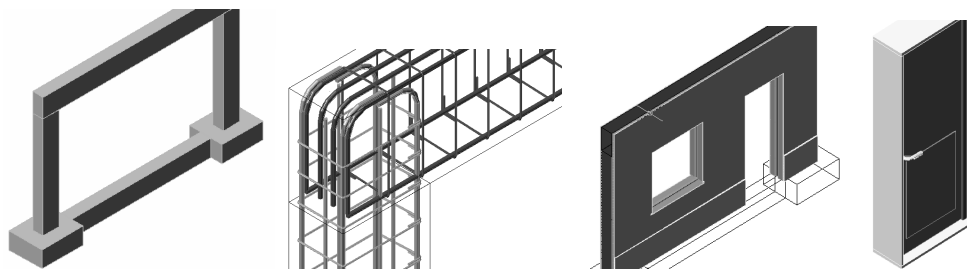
Details of the structural, vertical and opening elements of the wall's 3D model
